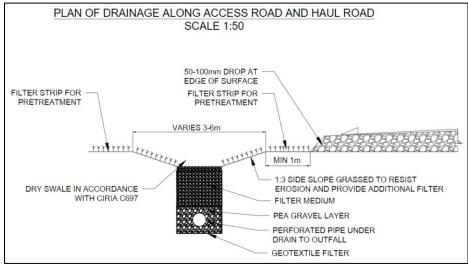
Typical filter strip, swale and infiltration trench arrangement adjacent to Contractor Compounds and Access Roads
